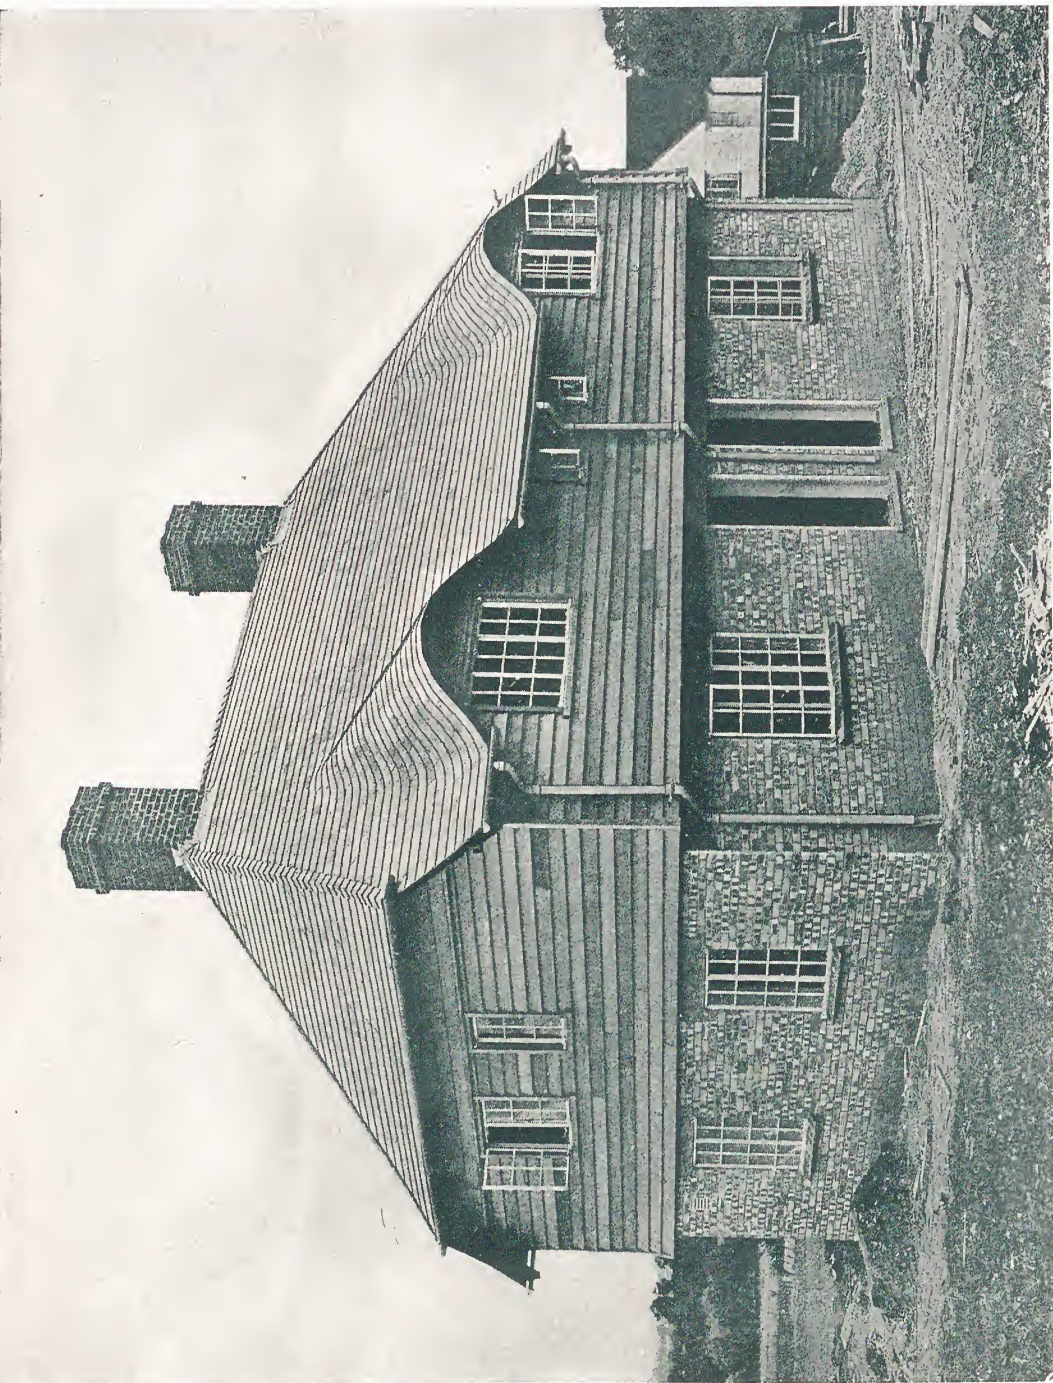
PAIR OF COTTAGES. UPPER FLOOR TIMBER-FRAMED AND WEATHER-BOARDED. ROOF COVERED WITH CEDAR SHINGLES.
